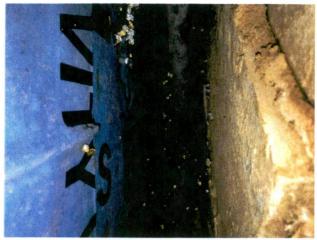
Areas of missing insulation were observed behind the precast units and below the ridge.
